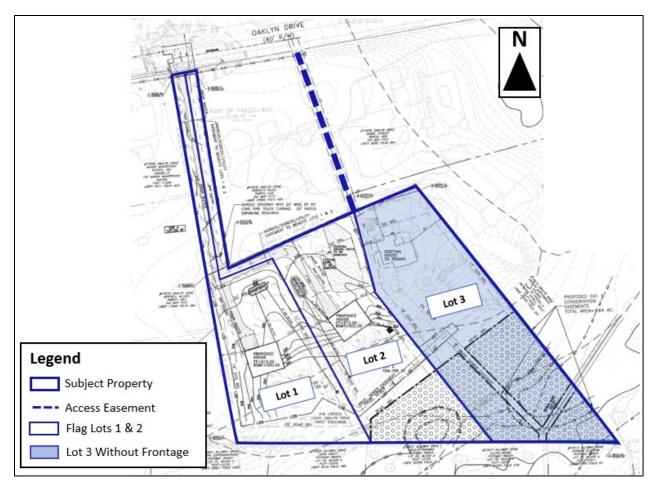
Administrative Subdivision Plan with Flag Lots 1 and 2, Lot 3 without Frontage, and the Access Easement
